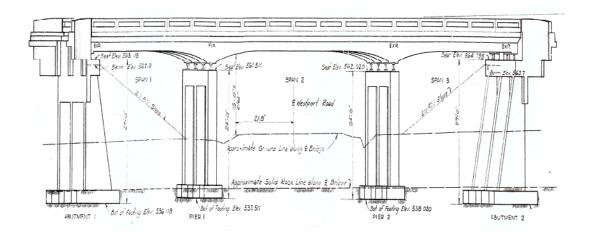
A typical spill-through abutment (bridge No. 056B00489N)
